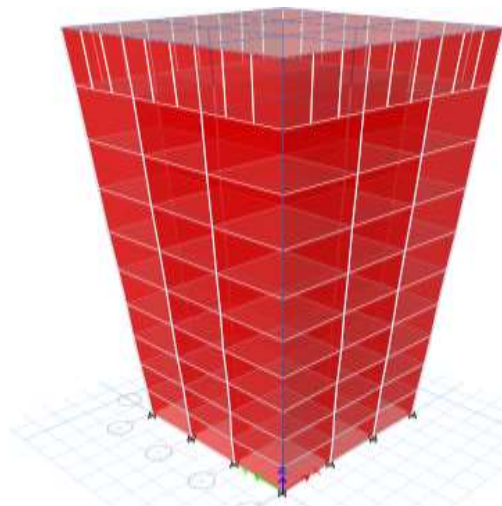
3D View of Deformed Shape of Filled Elevated Compositd Water tank
